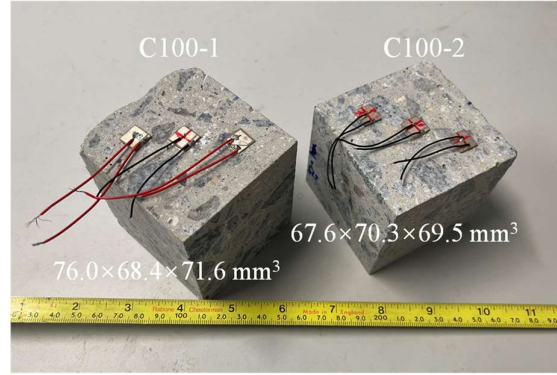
Concrete core of the specimens C100-1 and C100-2
